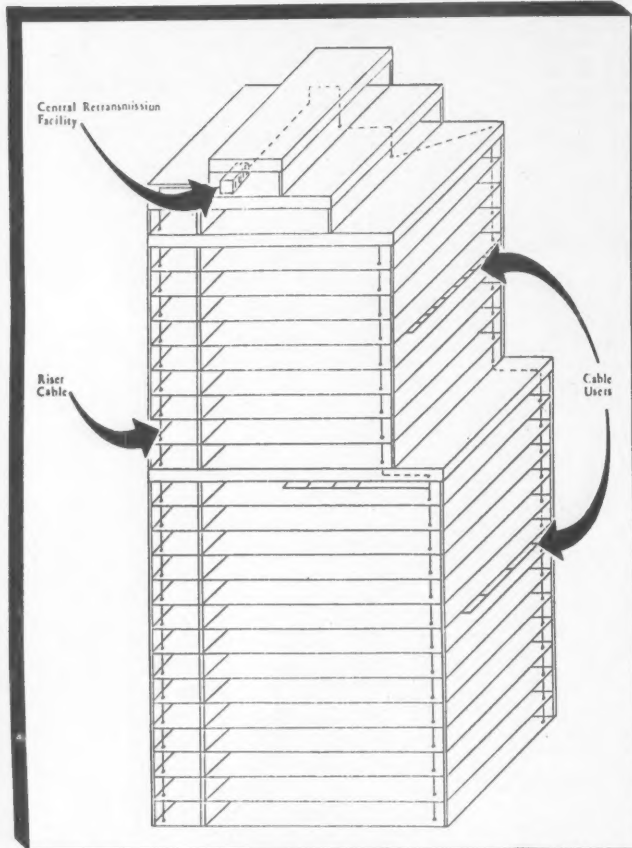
High-Rise Information Network Cabling Simplified. A single branching cable outlet network feeds the building through a riser cable that branches to outlet groups on each floor. Outlets may be placed in the wall or floor or in landscaped office partitions.
